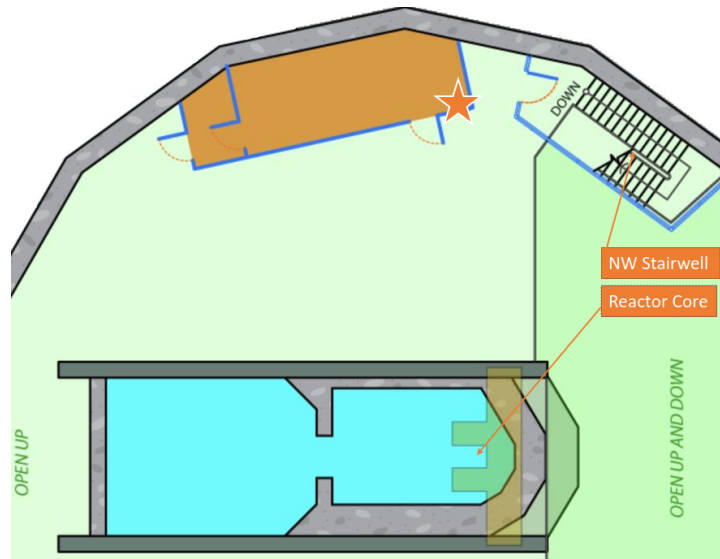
Floor plan showing Location 5, indicated by a star, in reference to the NW stairwell and the reactor core.
